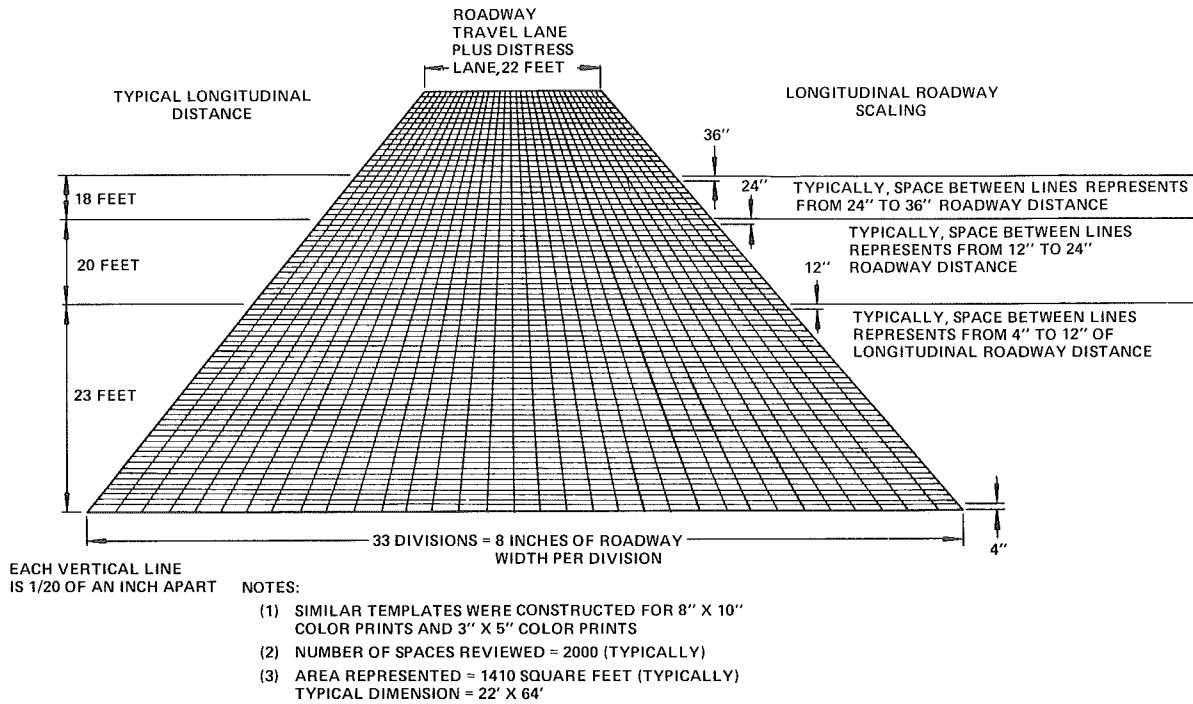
Template – Crack Count Survey, Glass Template Used, For 5" x 7" Color Print Crack Interpretation (Note 1)
